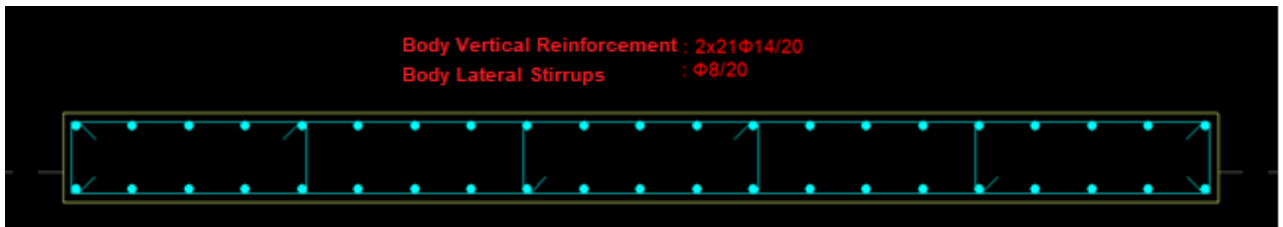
Shear Wall Reinforcement Plan of 4 Storey Building (dimensions: 380cm/30cm)
